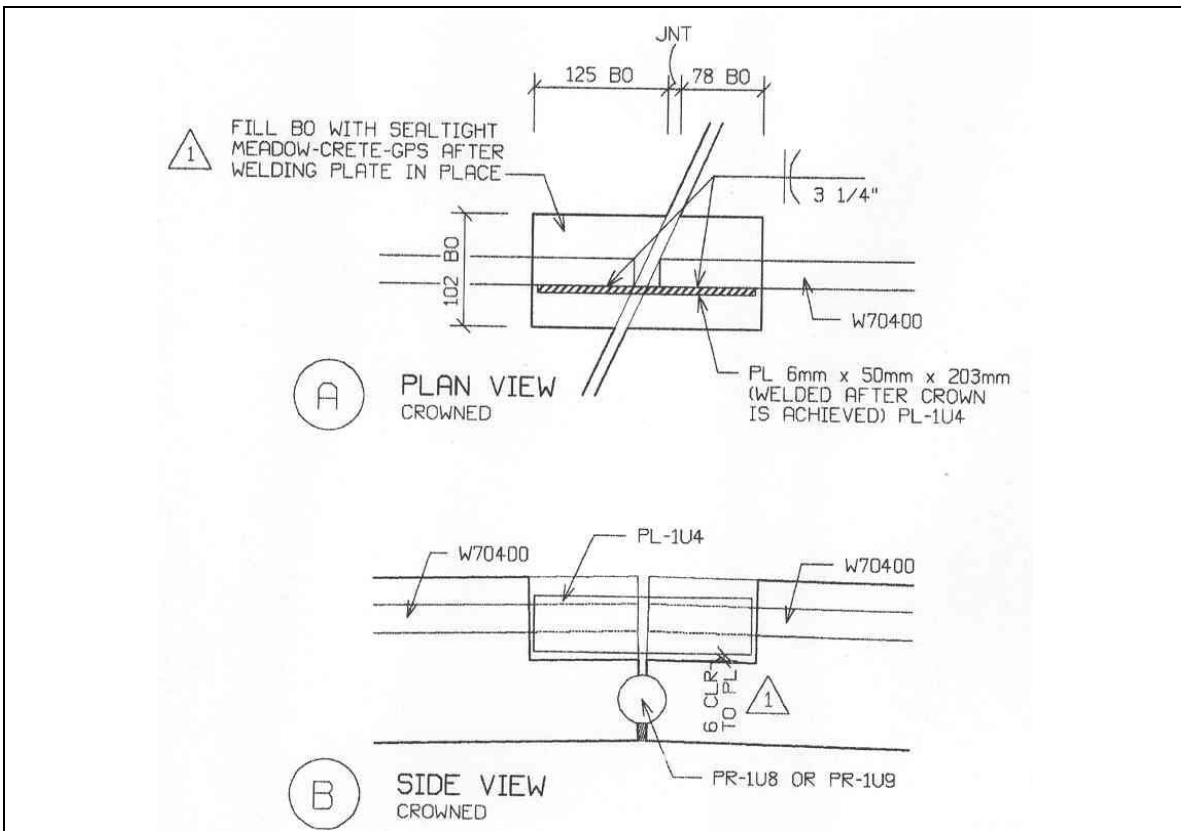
Typical hinge section details after the crown is formed (NDOR, 2003)
